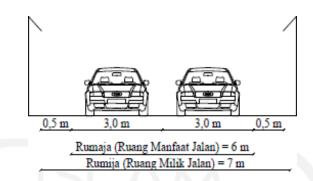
Cross Sections of Jalan Margo Mulyo
